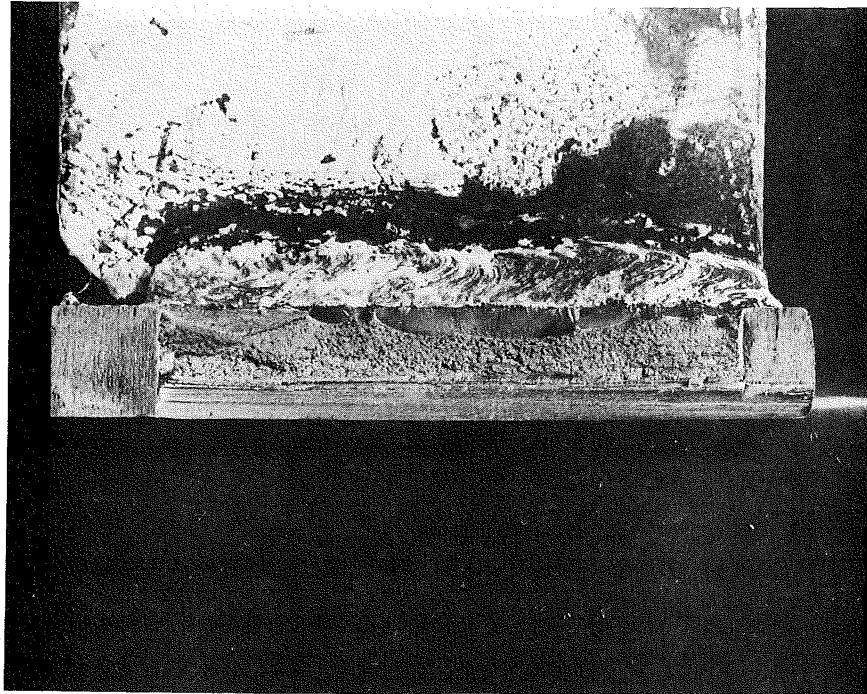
Multiple Fatigue Crack Growth at the Toe of Type 3 Stiffener-to-Tension Flange Weld
